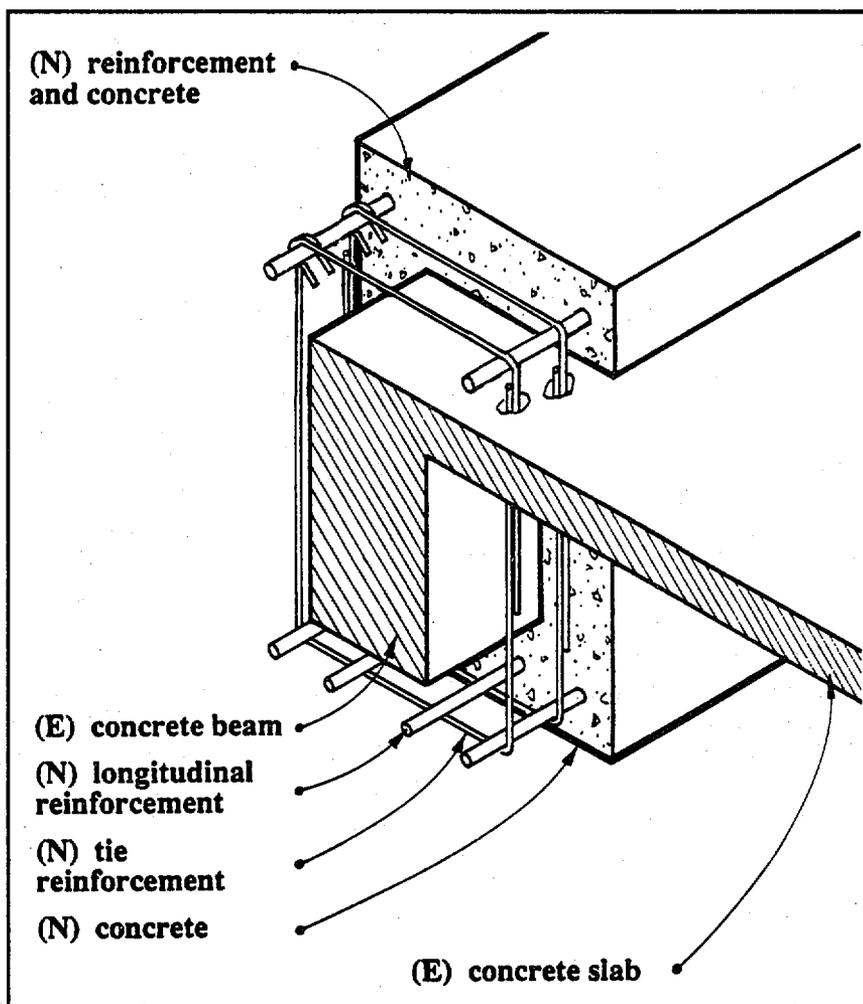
Encasing an existing beam in concrete.
